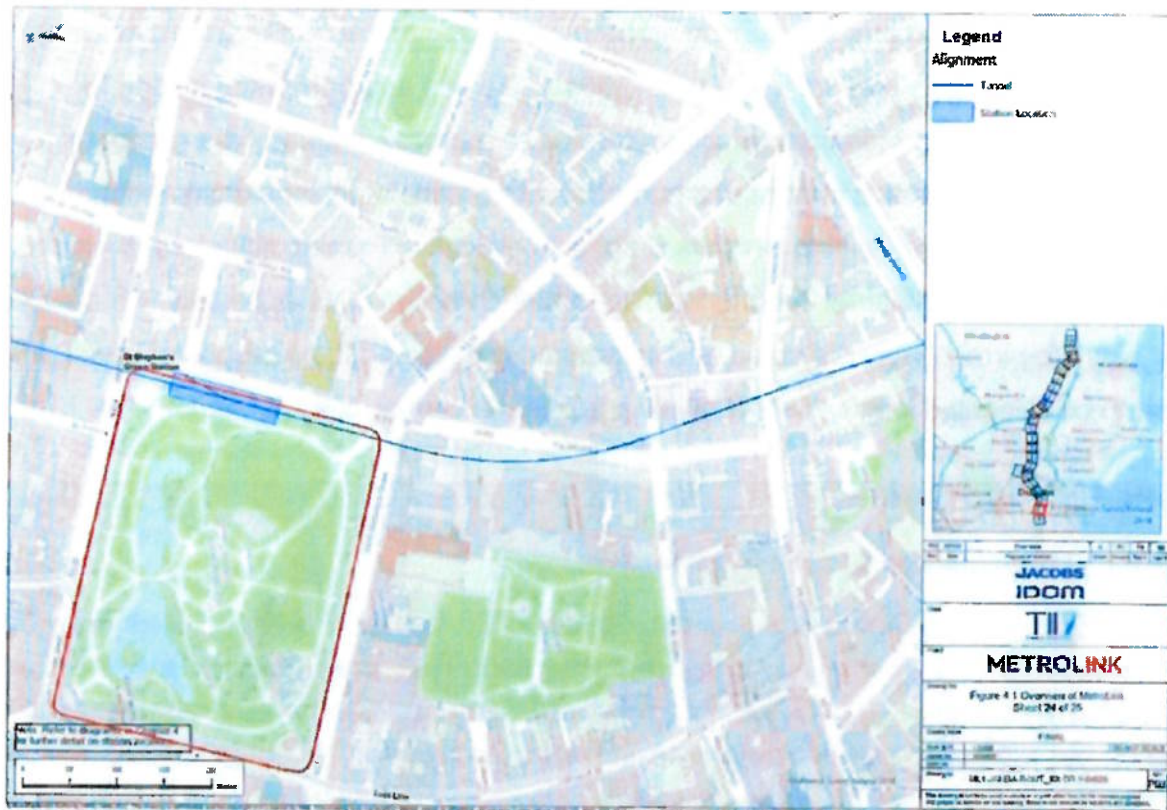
Plan Showing Horizontal Alignment (extract from ML1-JAI-EIA-ROUT_XX-DR-Y-04026)
